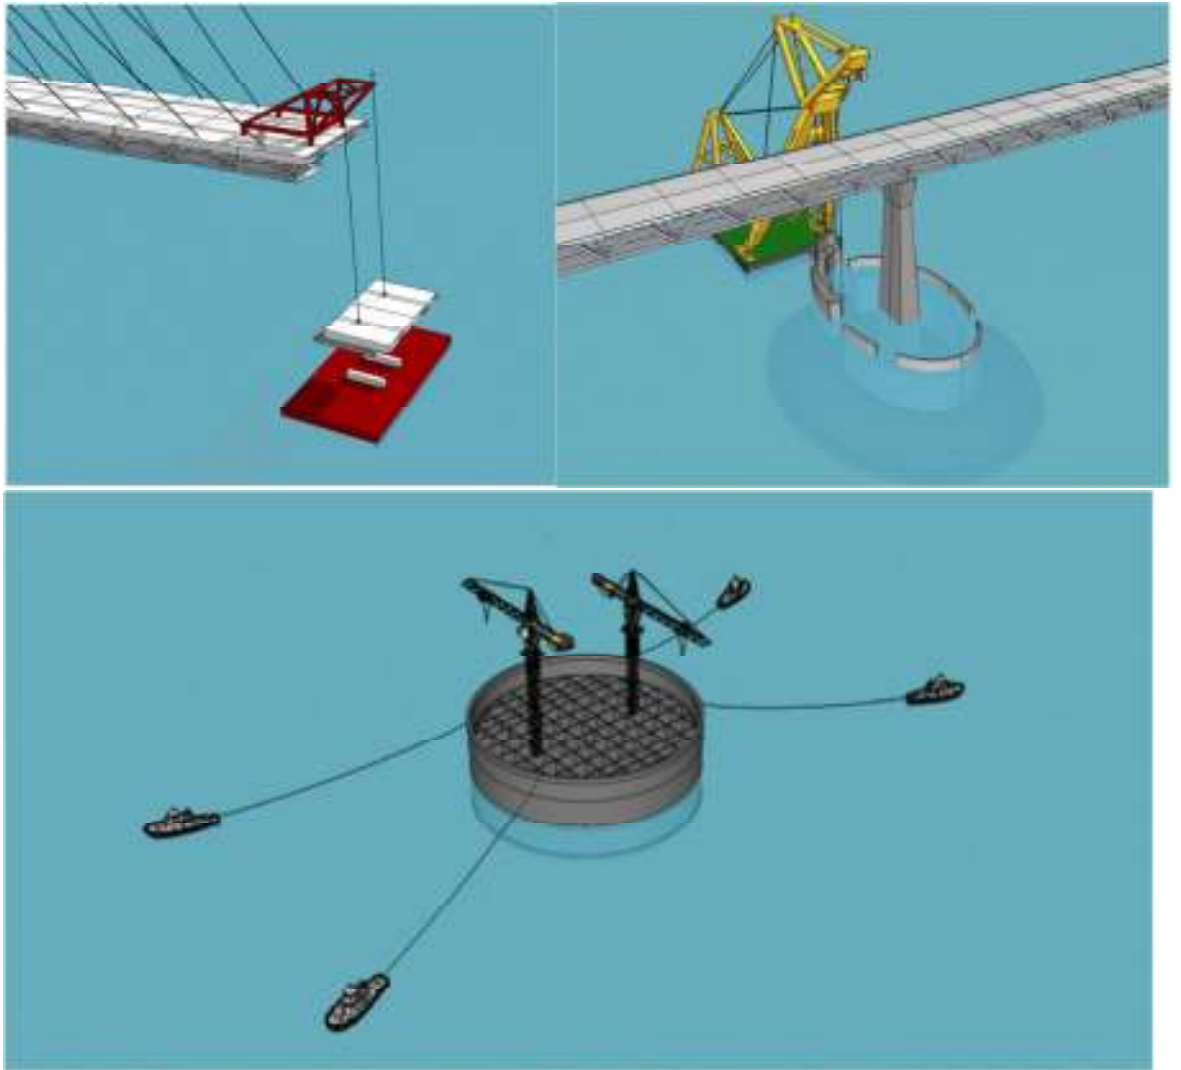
Examples of construction activities during the construction period of a cable stayed bridge: erection of a girder section (upper left picture), erection of ship impact protection ring with sheer leg crane (upper right picture), transport, positioning and placing of the caisson for the centre pylon (lower picture; pictures taken from Femern A/S Consolidated Technical Report, version June-6, 2011).
